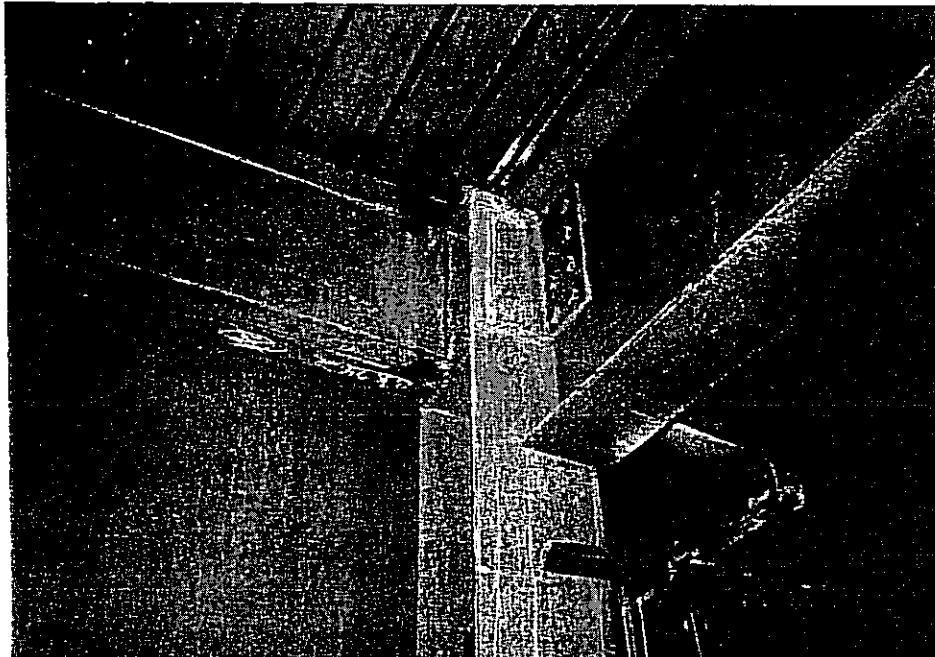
Typical connection of floor beams to column top. Notice the connection is not designed as a moment resistant connection. The steel deck floor is tack welded to the floor joist.
